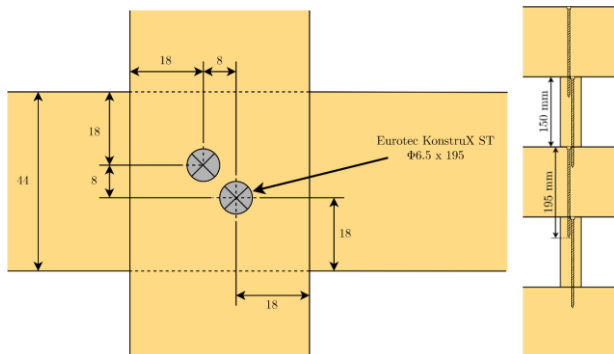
Plan and elevation of connection detail from roof (lengths in mm)
